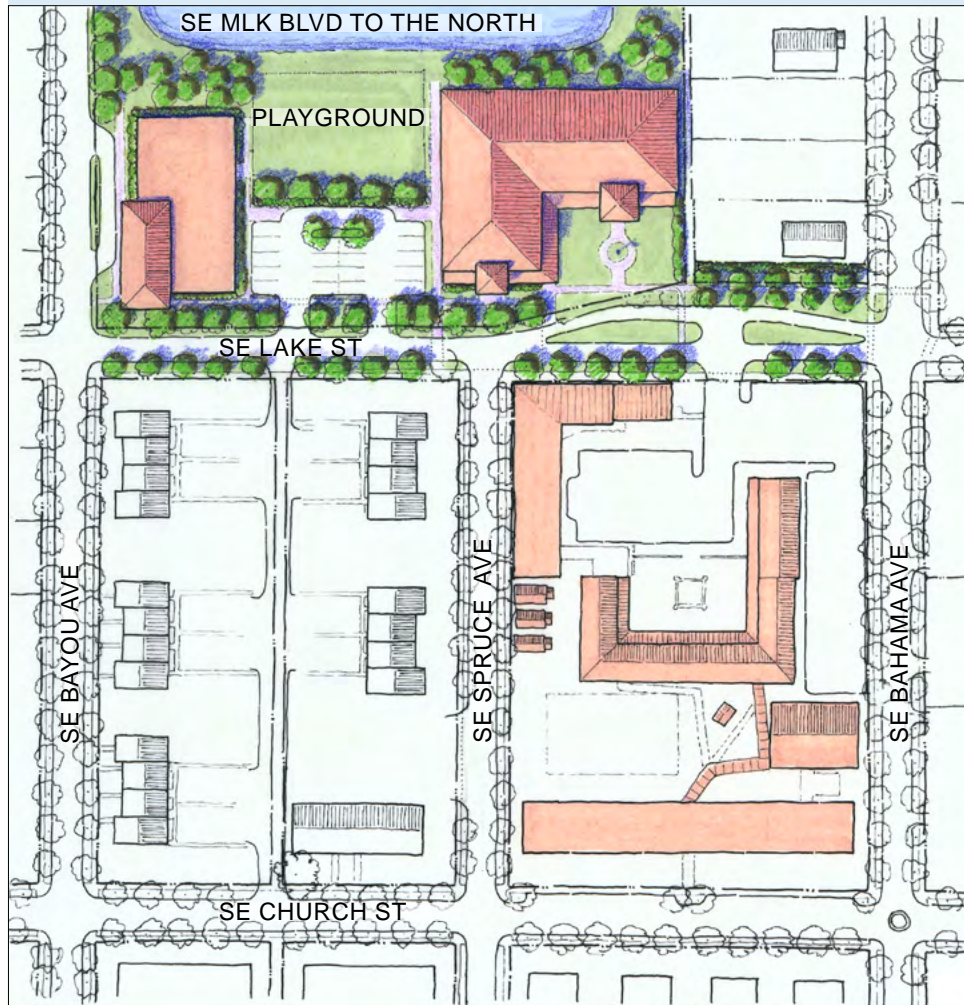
The image above of the planned Boys and Girls Club designed by ADC Architects.
